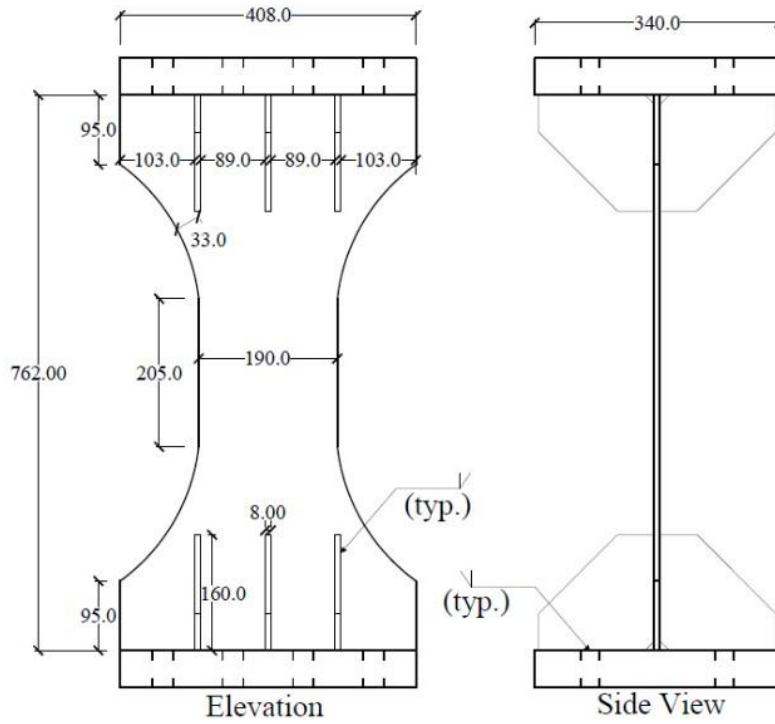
Dimensions of the flat plate specimen (in millimeters).
